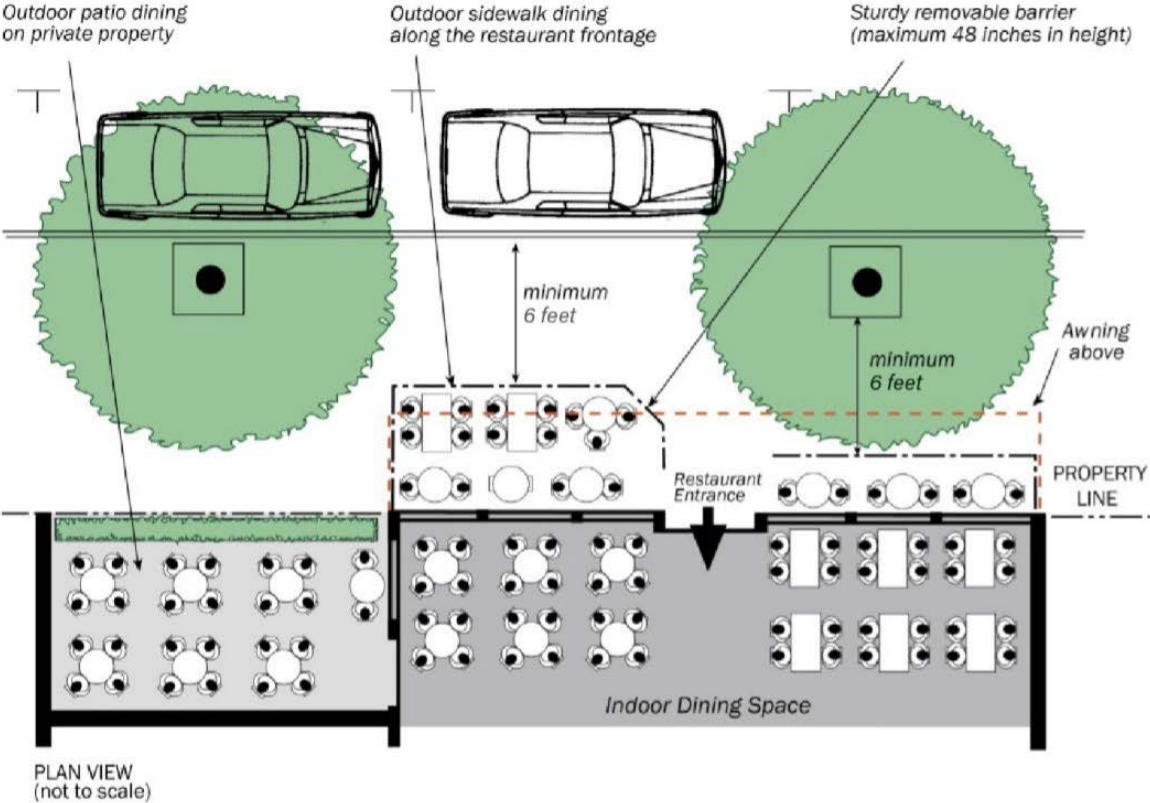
Outdoor dining standards for areas other than the Compton Walk.
